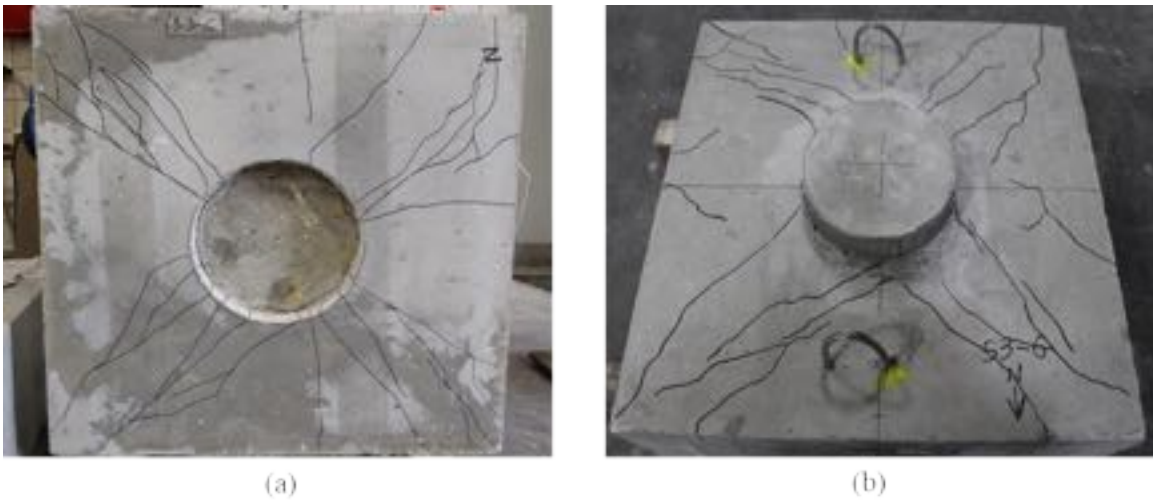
Cracking after testing on (a) bottom and (b) top of Specimen S3-6
